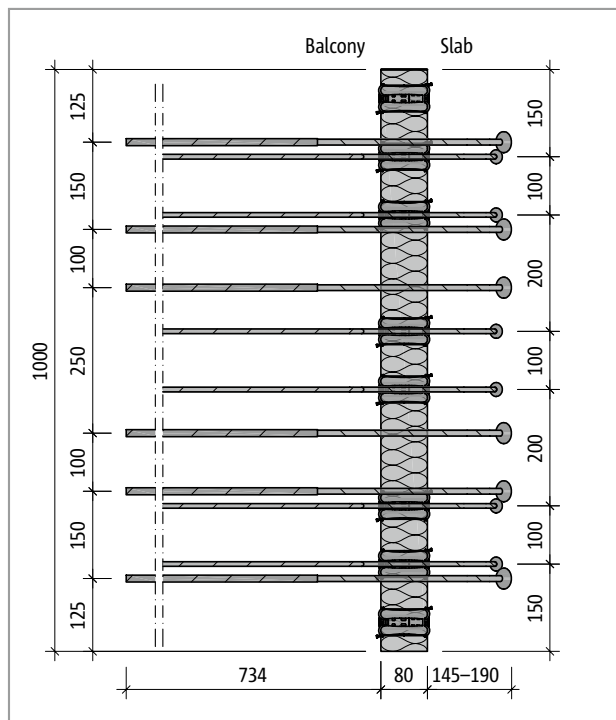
Schöck Isokorb® T type K-O-M2: Product layout
